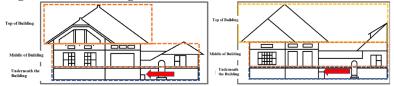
Front View (Façade) of House Type 4<sup>de</sup> (left) and 3<sup>de</sup> (right) *Beamtenwoning* and SS Manggarai 4 and 5 rooms
